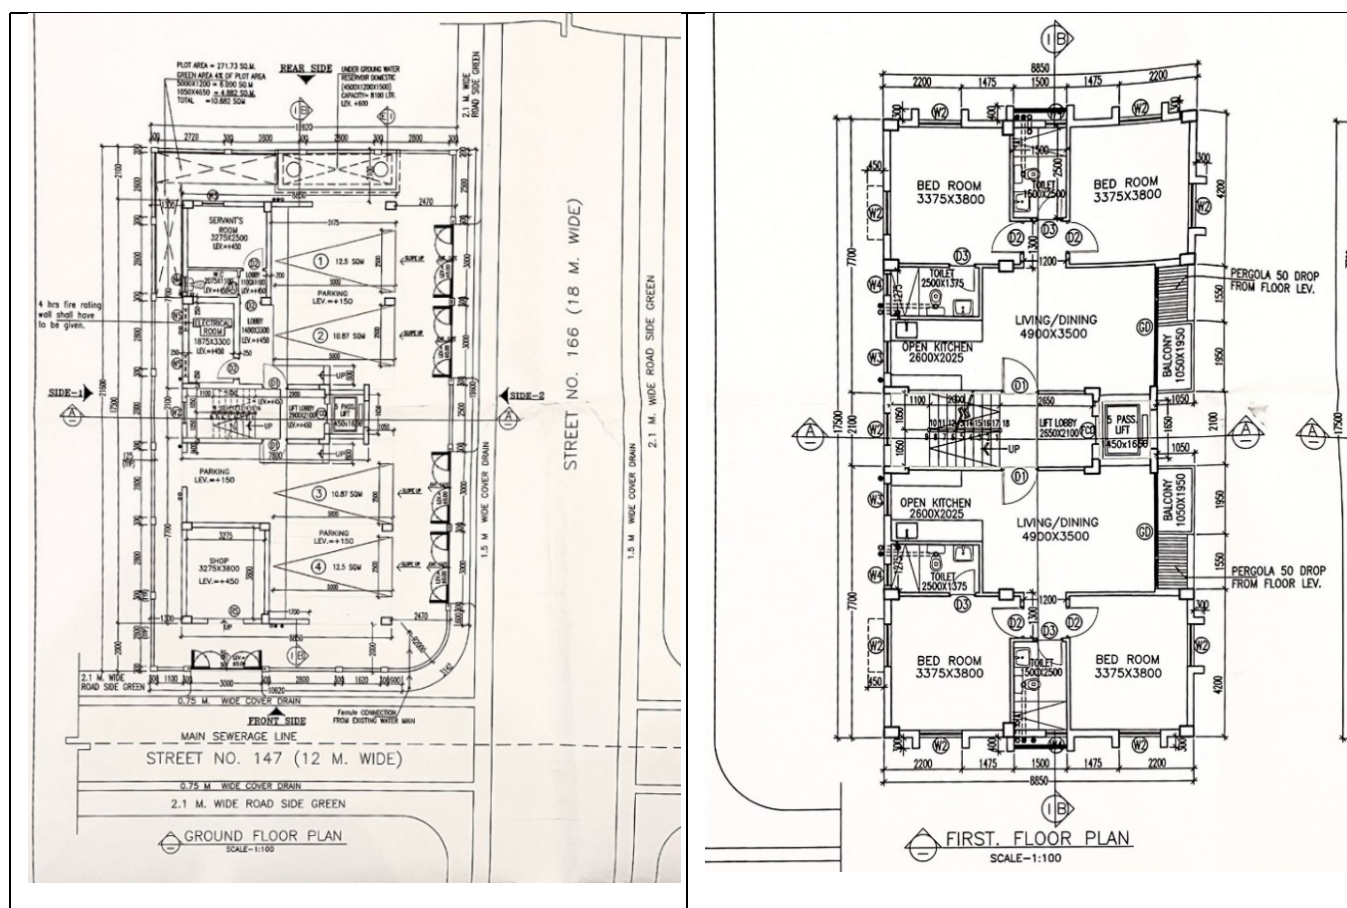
Ground Floor Plan & Typical Plan for 1st, 2nd and 3rd Floors
